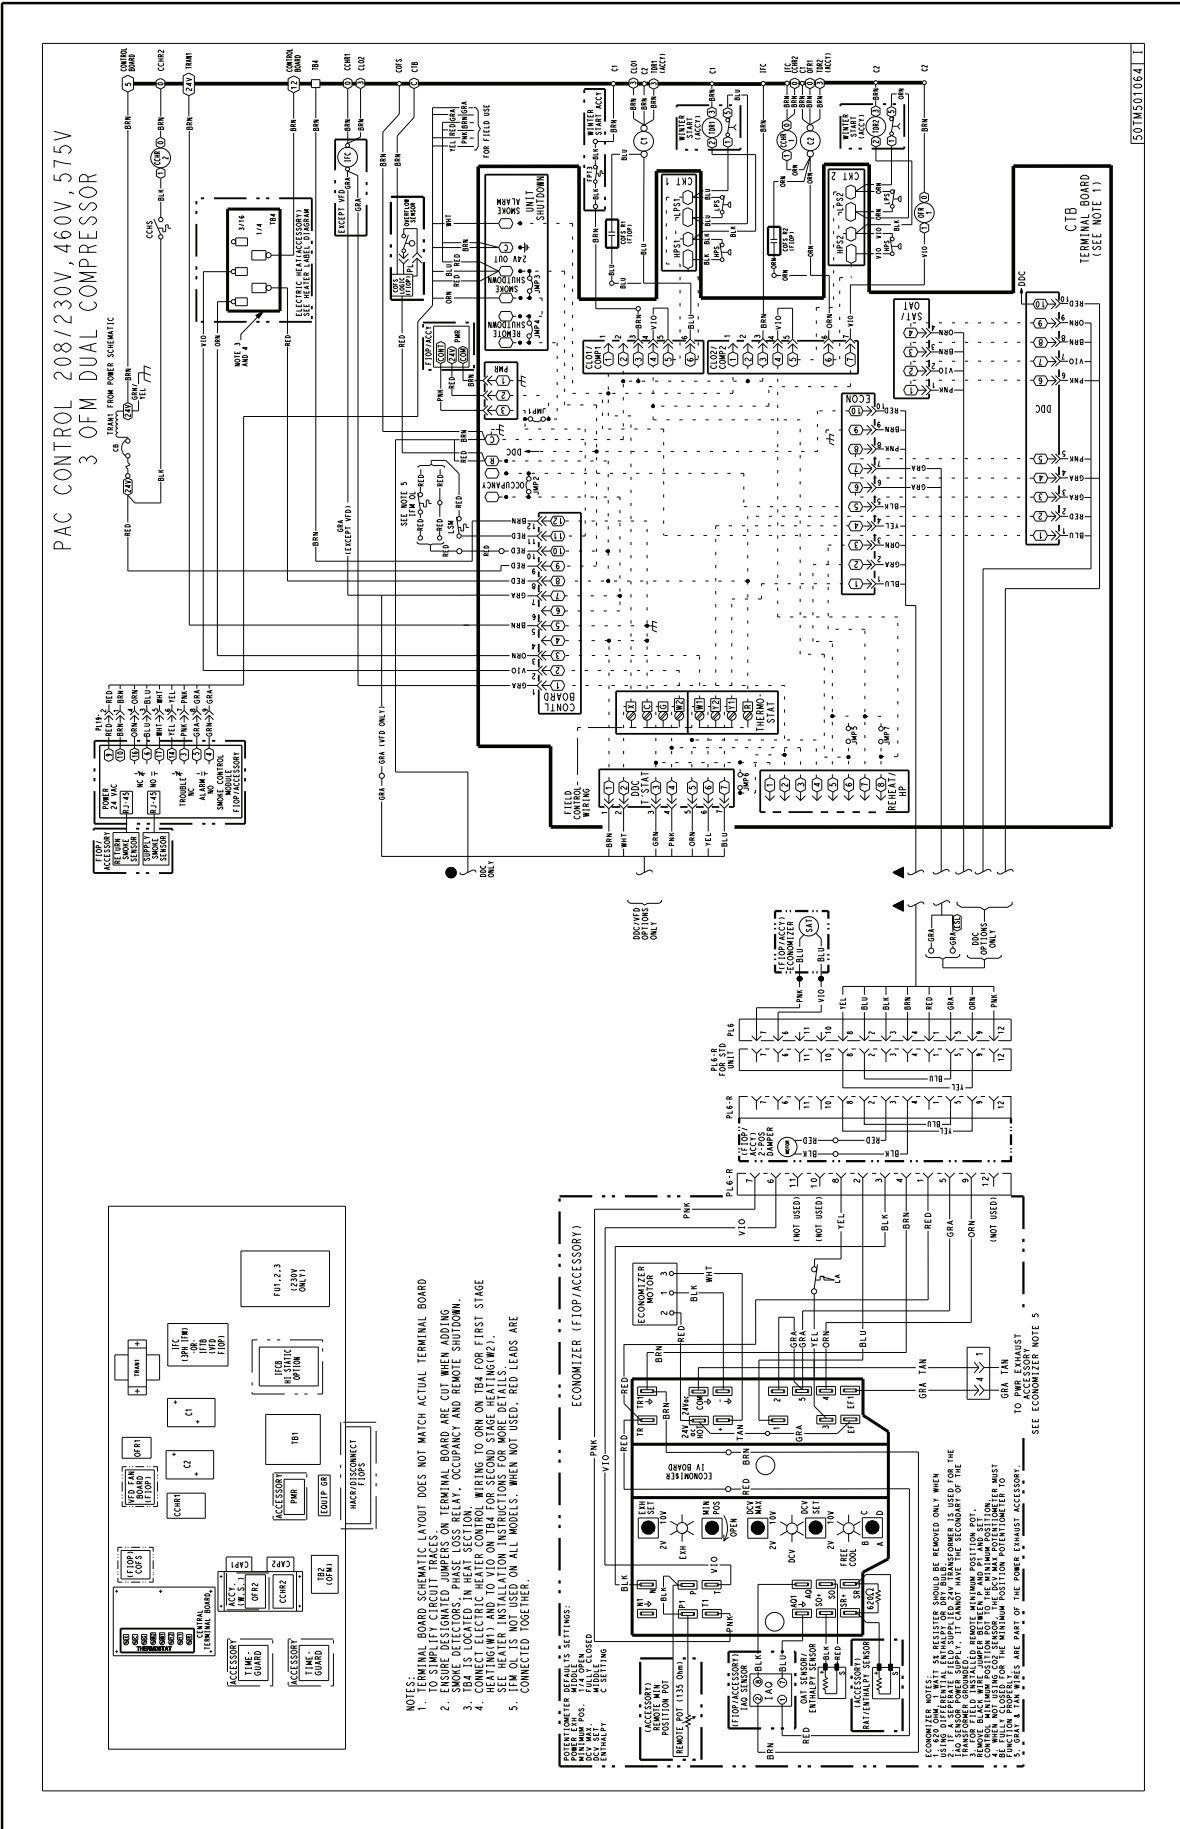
Control Box Layout - Packaged Air Conditioner
